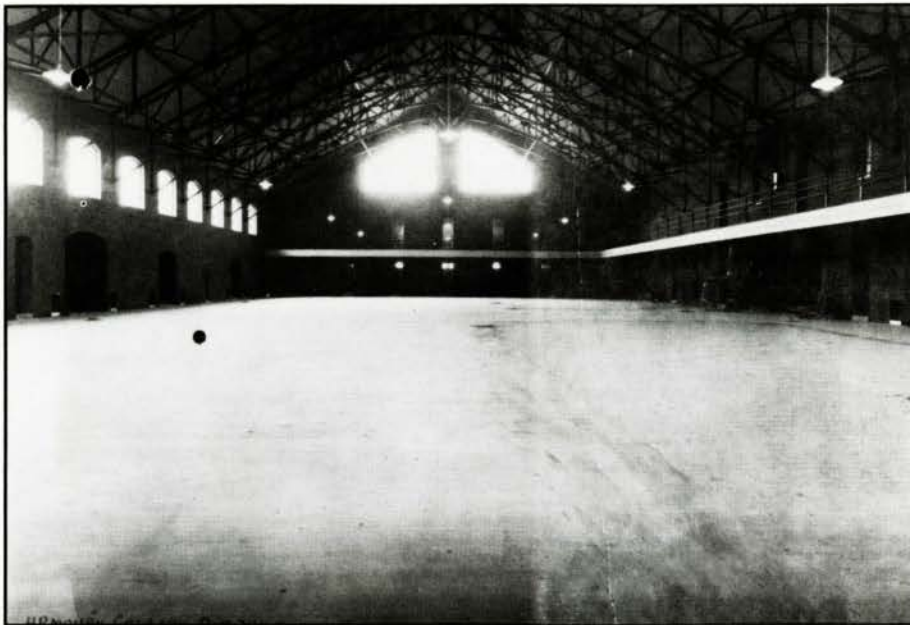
Mewata Drill Hall, Calgary: view of the interior in 1918 showing the steel trusses. (National Archives, PA 53022)
